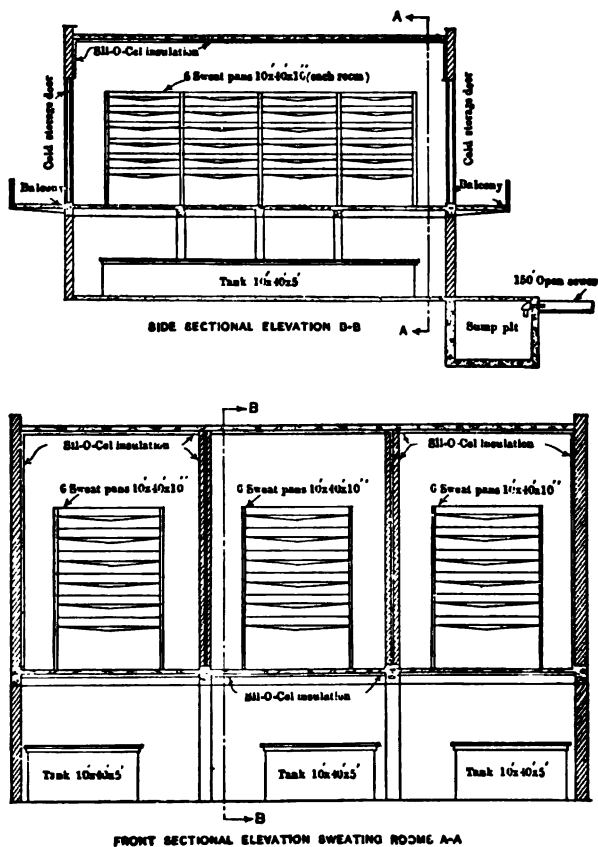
Sectional side and end elevation of a three-oven sweating building.
